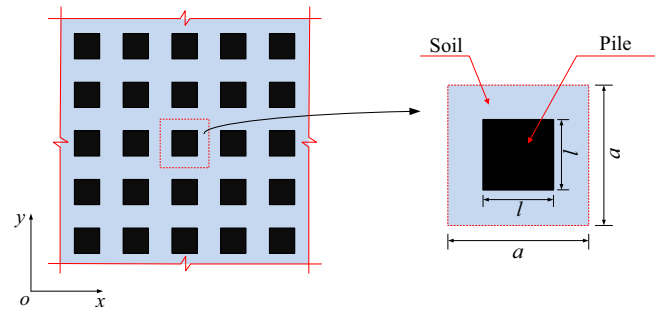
Cross section of periodic pile barriers and a typical unit cell.
